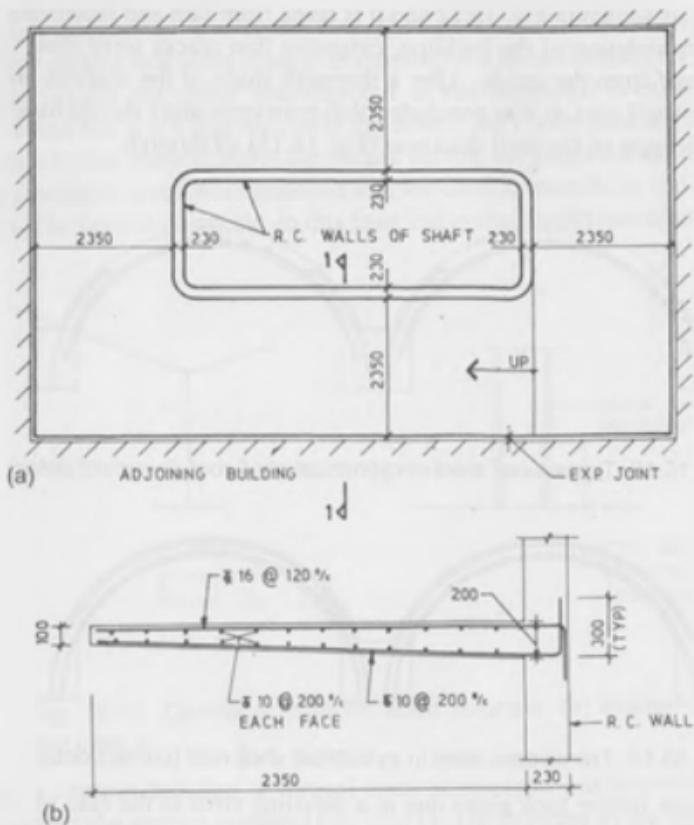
Plan of ramp in a hospital. (a) Plan; (b) Section 1-1.
